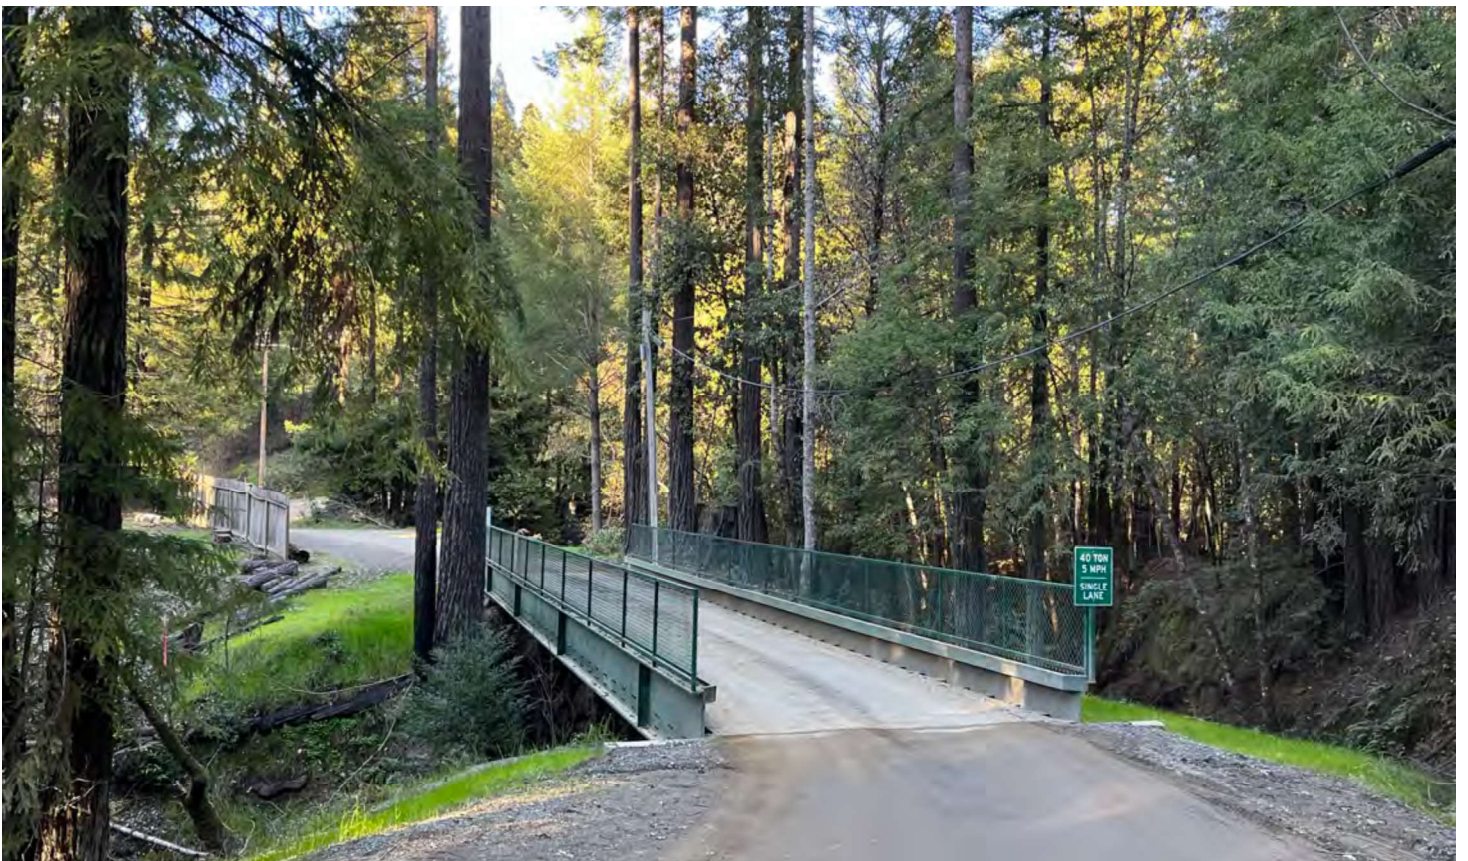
New Middle Bridge on Palmer Creek Road looking North
